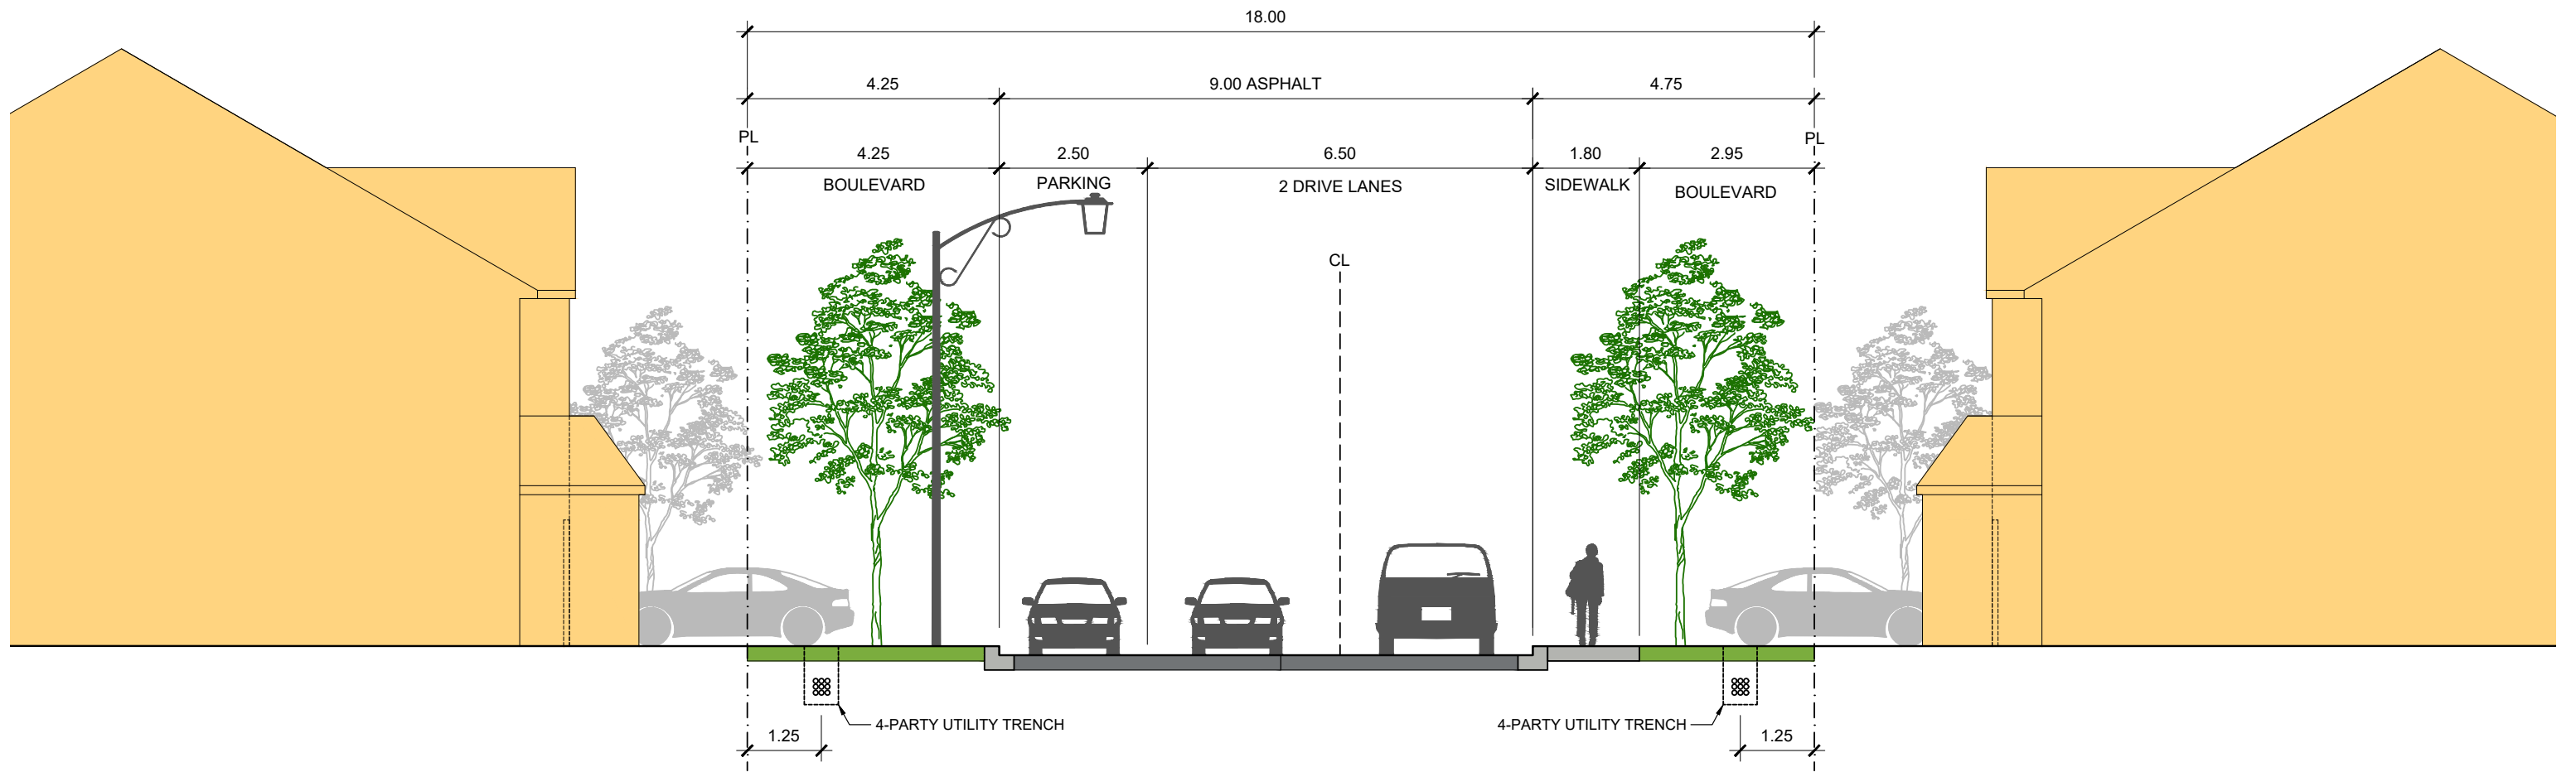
Local Road (Typical 18.0m Right-of-way) Cross Section
